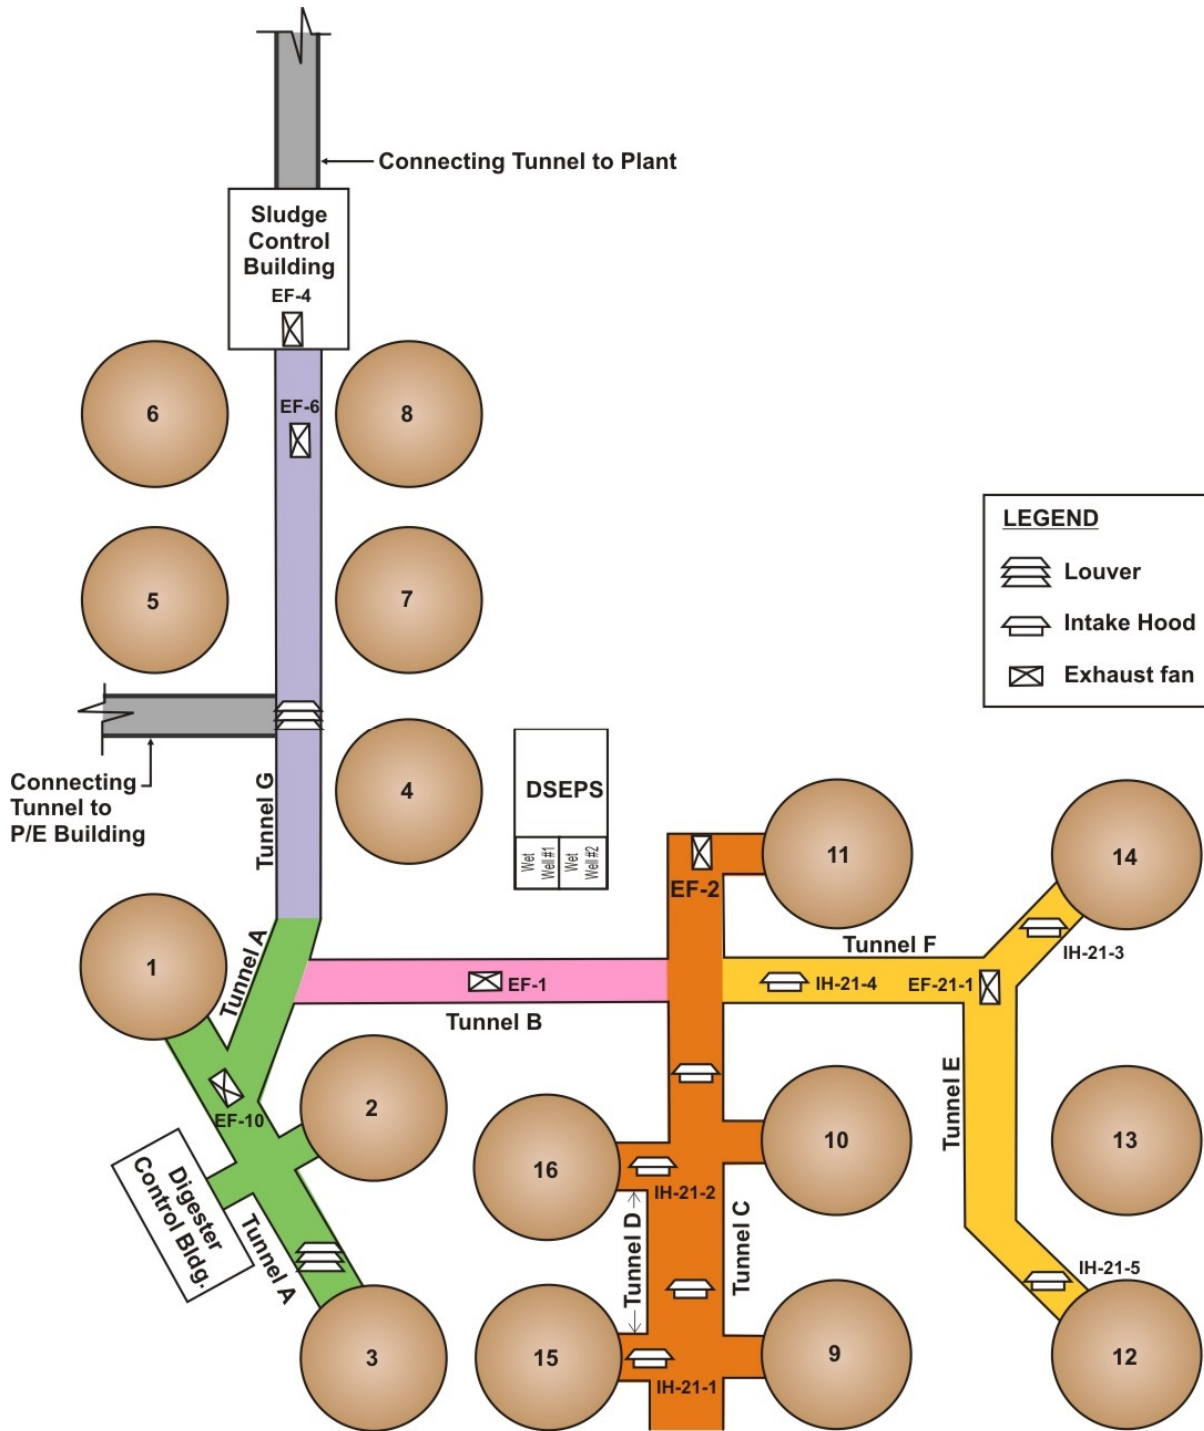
Digester piping tunnels at San Jose / Santa Clara WPCP
